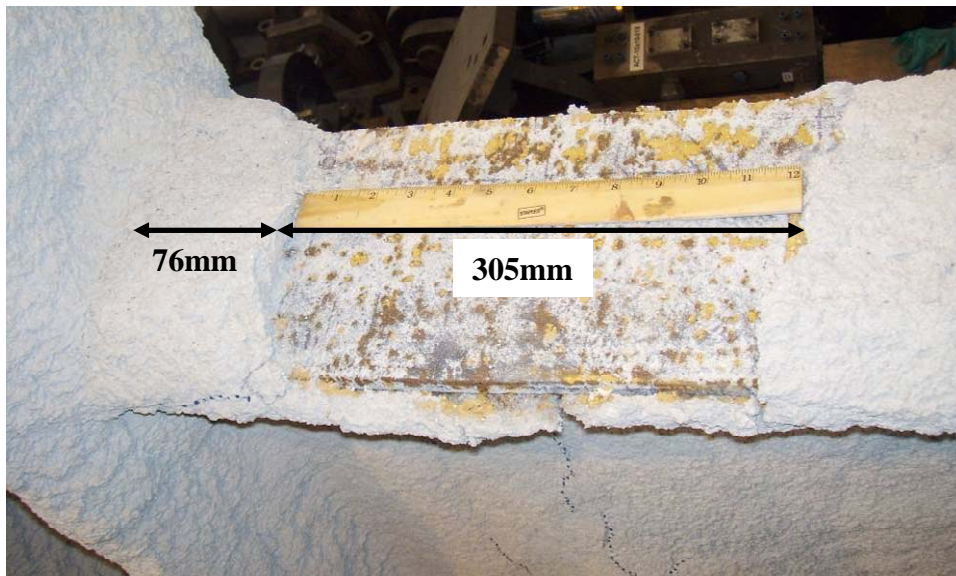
Damage to SFRM on top of top flange of WM assemblage during post-testing inspection
